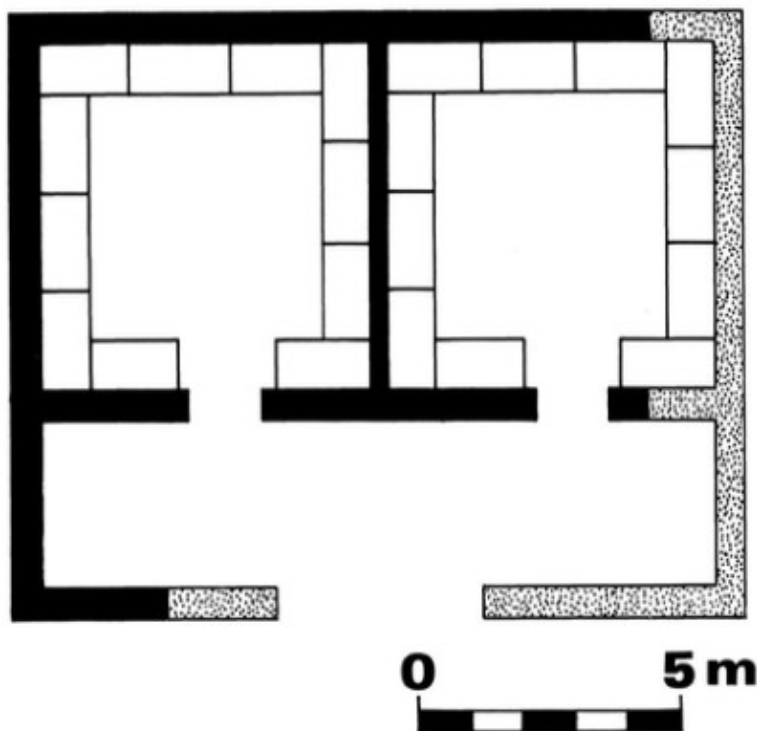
Ground Plan of the building at Marmaria (Bookidis, 1983: fig 3)
